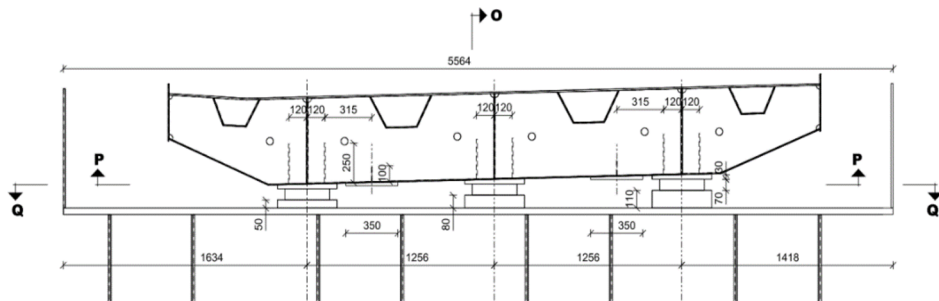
Stepping of a steel pedestrian bridge on a steel plate welded to the upper edge of the sheet pile wall.
